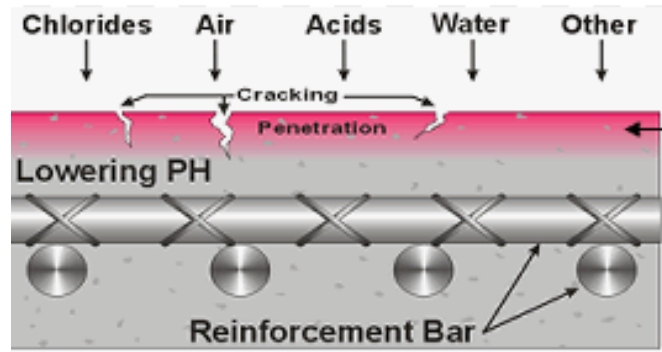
Cracks in concrete(“Cathodic Protection Technology | Engineered Concrete Corrosion Repair and Prevention” n.d.)
